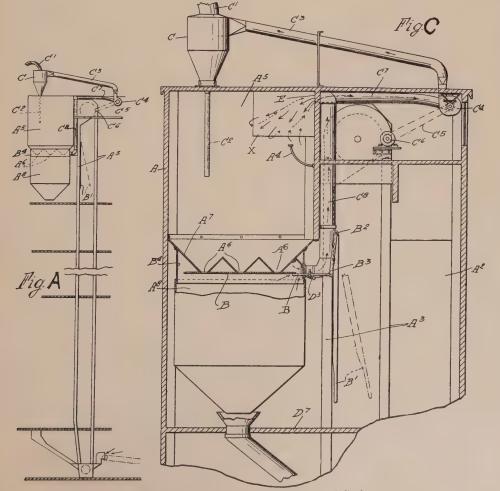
Fig. A. Elevation of Leg, Garner and Scale. Fig. C. Section along Line 4-4 of Fig. B.
